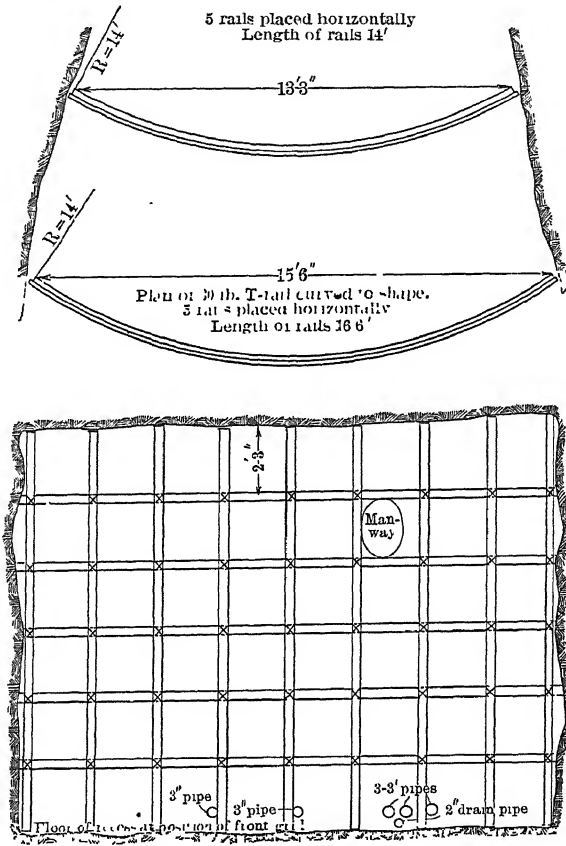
DETAIL OF REINFORCEMENT GRILL BUILT OF 30-LB. MINE RAILS FOR NO. 16 LEVEL BULKHEAD. RAILS SPACED AT 2-FT. CENTERS.
